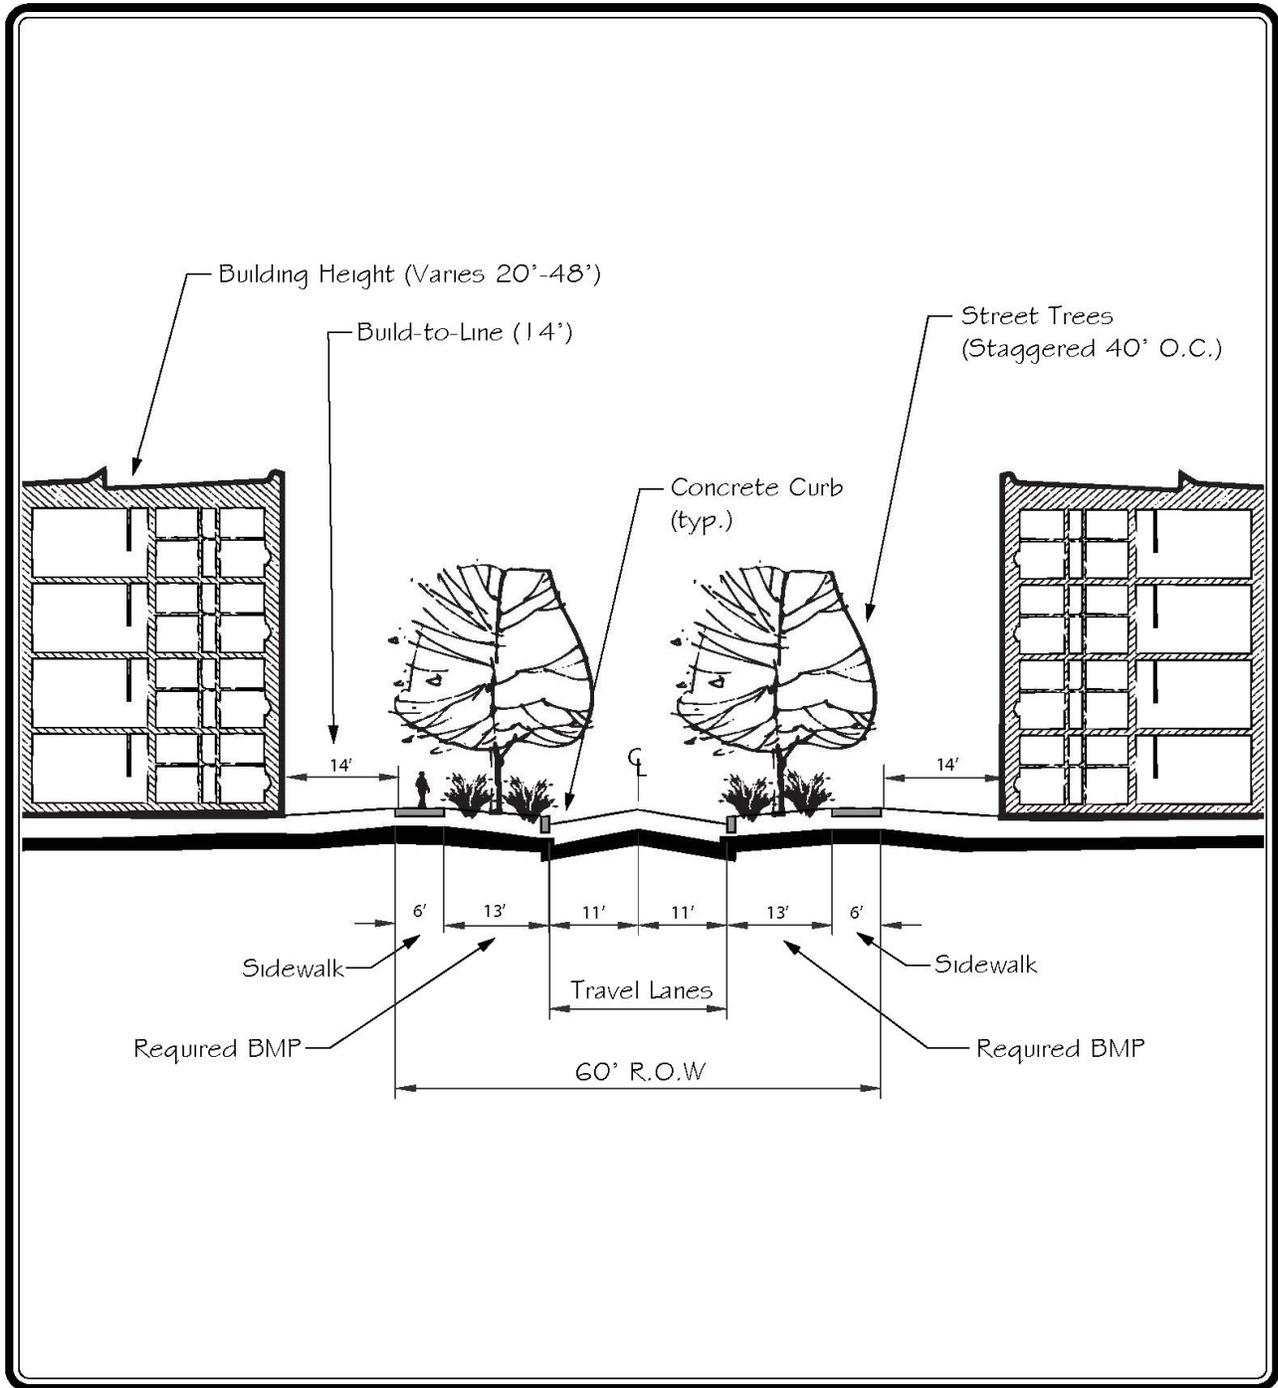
SECTION 314.05 – 04 TYPICAL COLLECTOR ROAD DETAILS WITH NO PARALLEL PARKING
